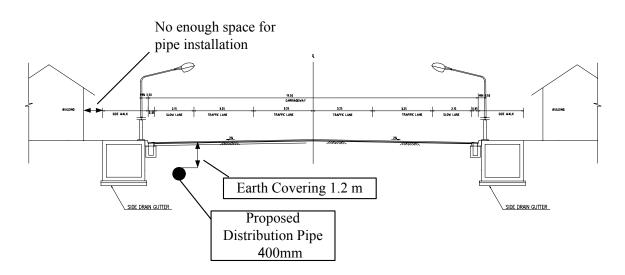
Location of Distribution Pipe No. 1 along the T2 Road (from Road No. 1 to 2.86 km point)
